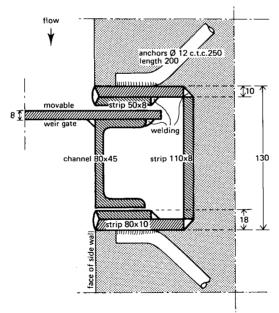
Sections showing groove arrangement for weirs between 1.5 m and 4.0 m wide (dimensions in mm).
